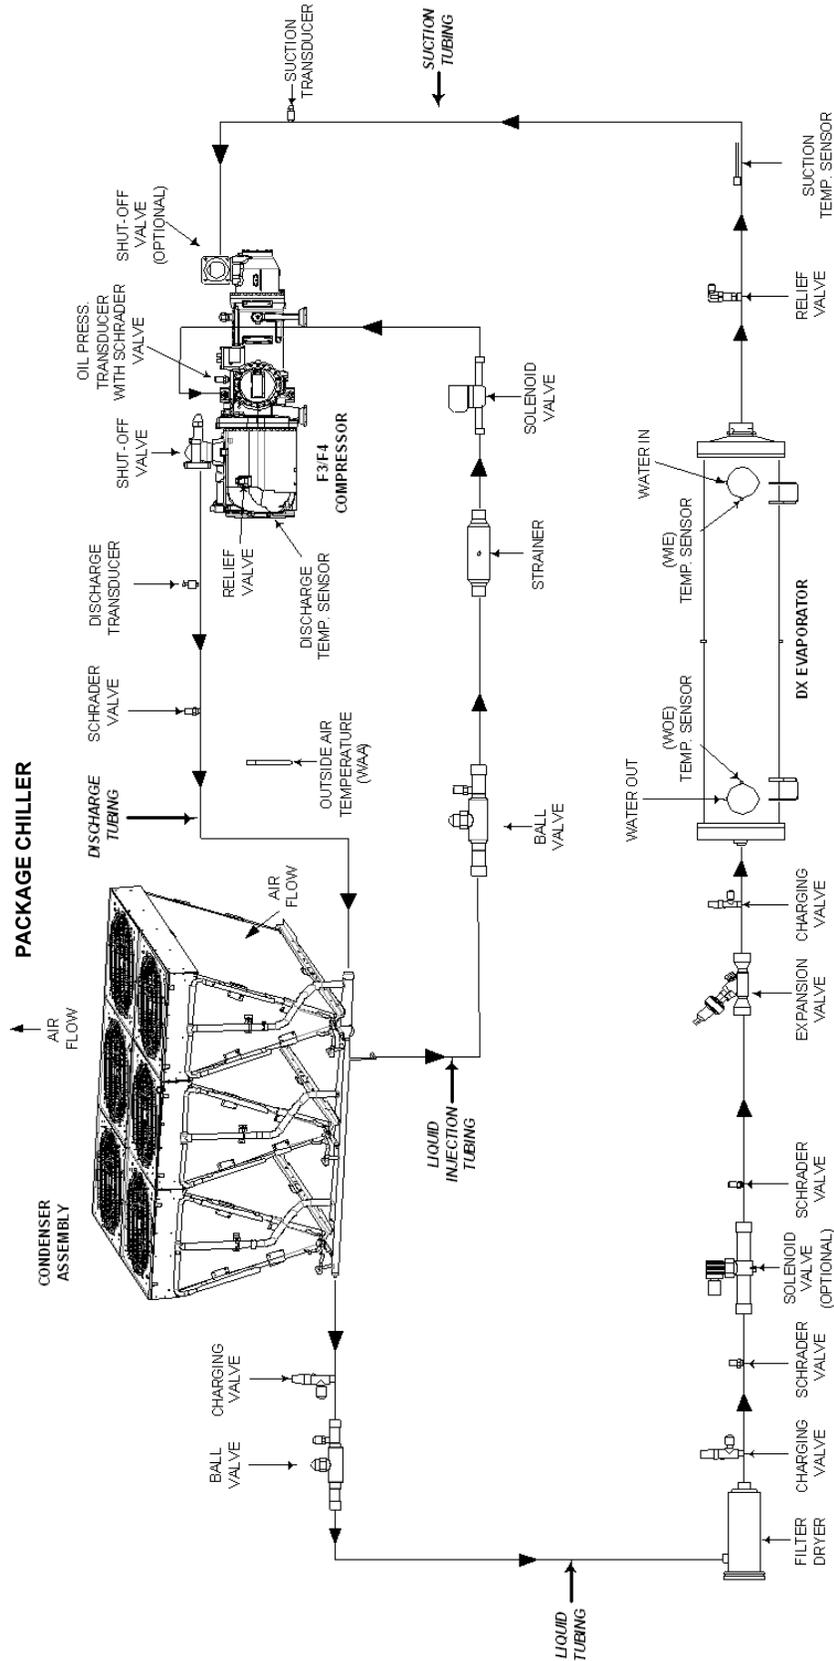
Representative Refrigerant Diagram - Packaged Unit With Shell & Tube Evaporator Without Optional Economizer
